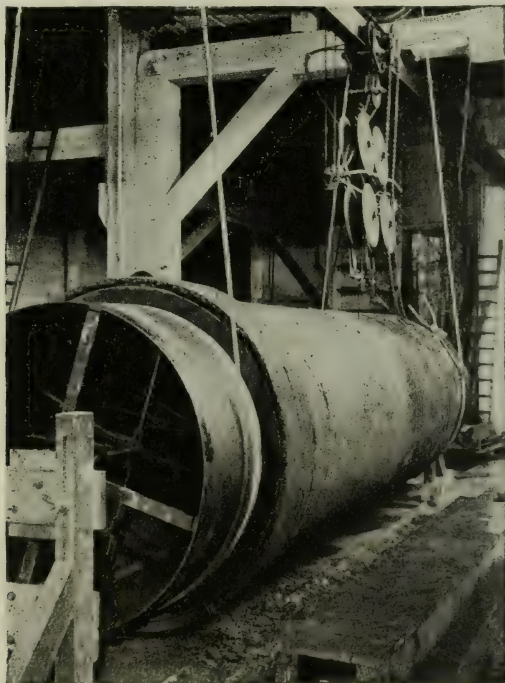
“Siegwart” Helical Reinforcement being wound on Concrete, followed by Concrete Covering.
